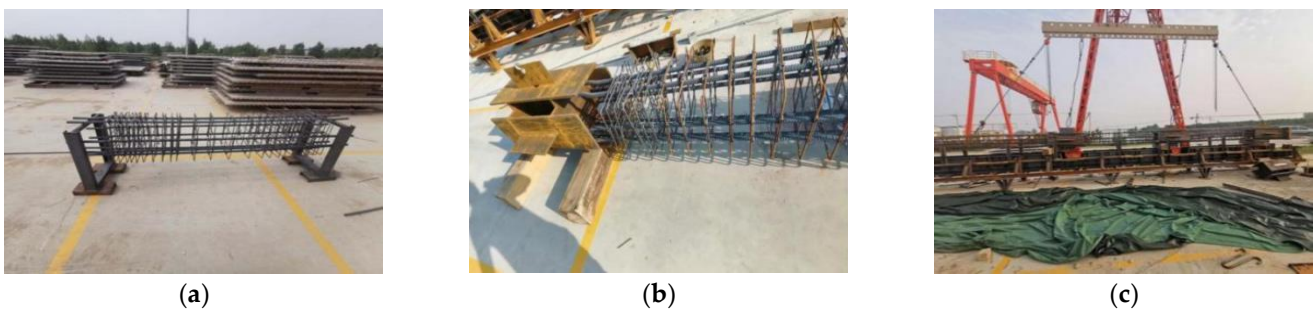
Production process diagram of the precast column: (a) binding of column reinforcement; (b) assembling steel joints and reinforcing steel skeleton; (c) column member is hoisted into the mold.
